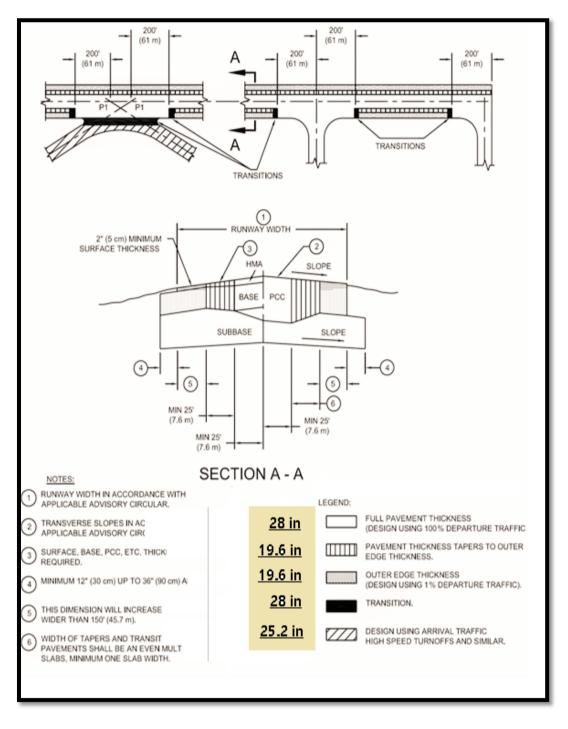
Typical Plan and Cross Section for KNIA Runway Pavement designed by AI method
